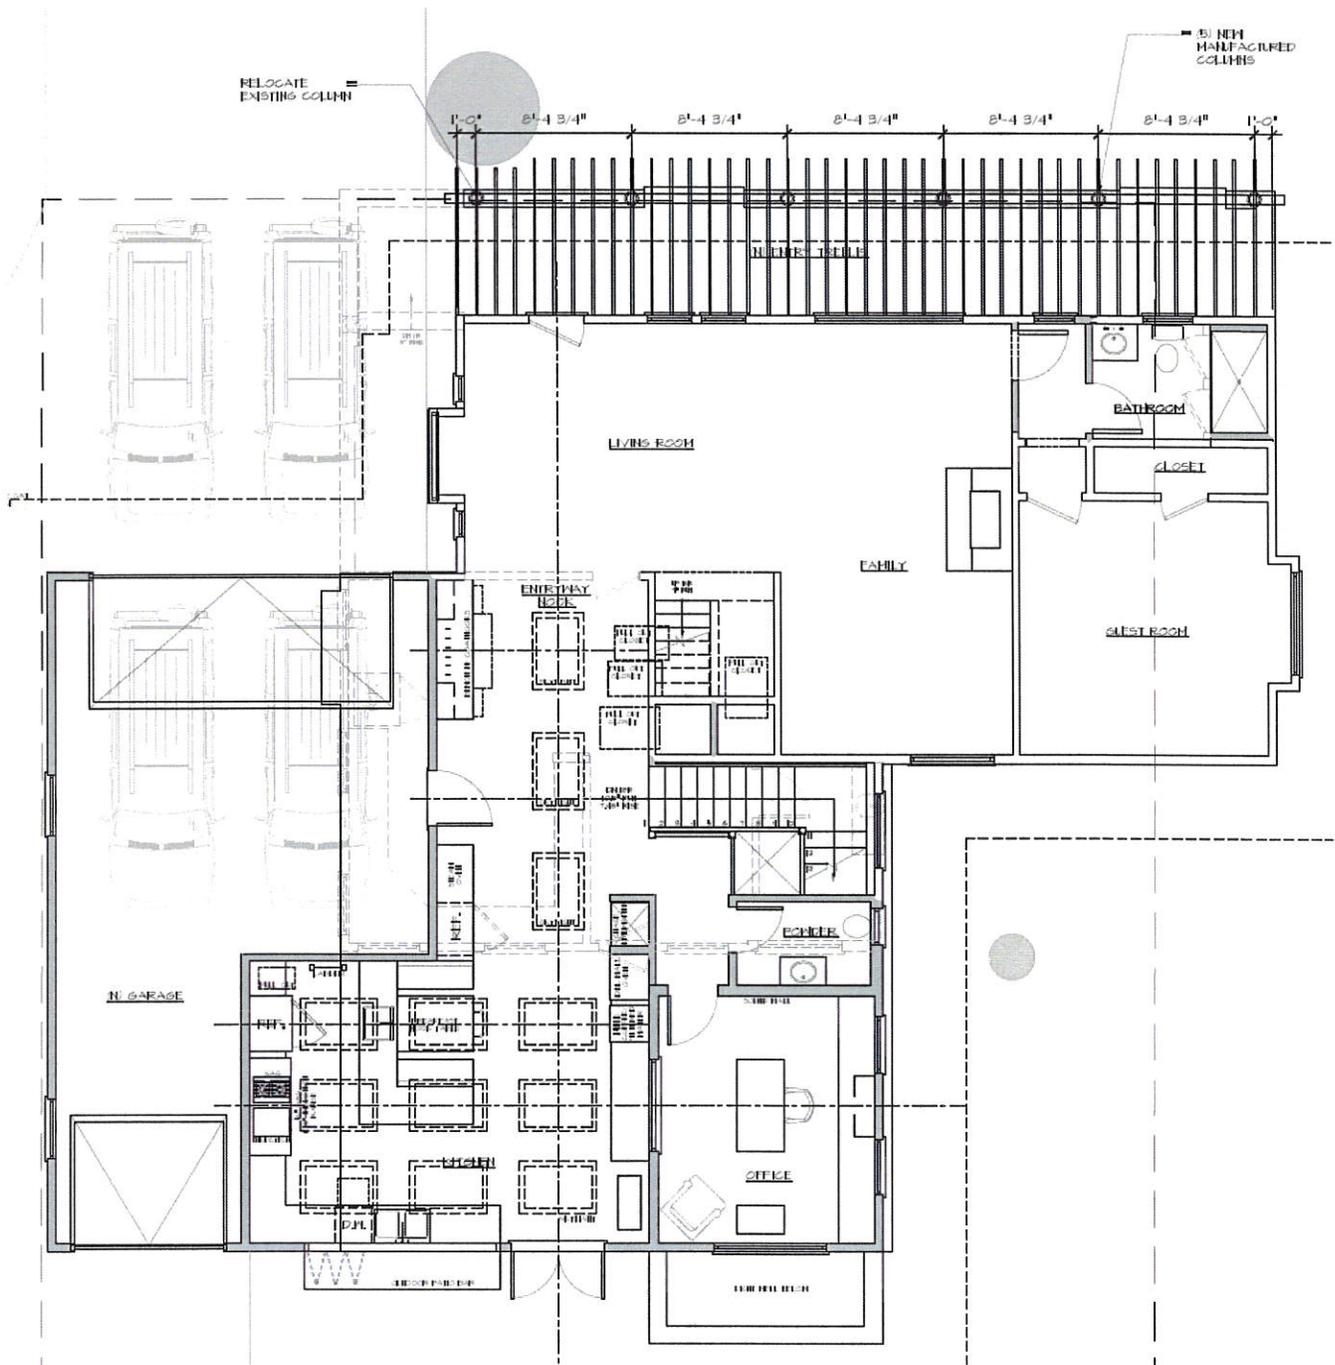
Proposed first floor plan: note the proposed addition is set back from the front façade and extends only onto the rear façade where the former addition was attached. The one-story additions is contemporary in design, respecting the historic elements of the Frank Bacon House. source Young and Borlik Architects Sheet A2 1.1
